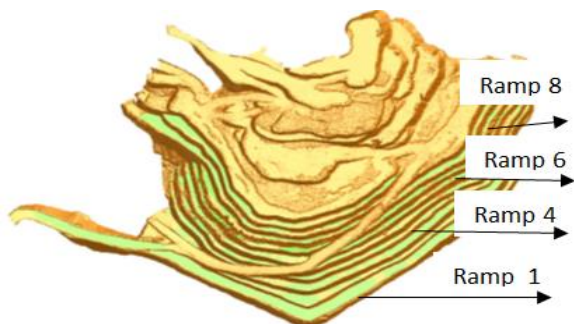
Randomly sampled ramps layout where soil samples were collected.
